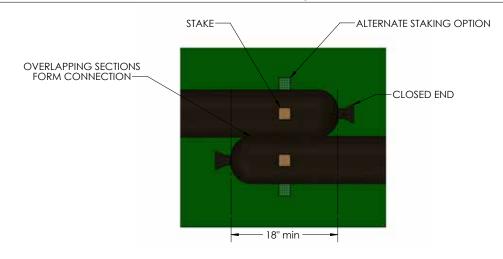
Engineering Design Drawing for Slope Interruption - Staking Details
